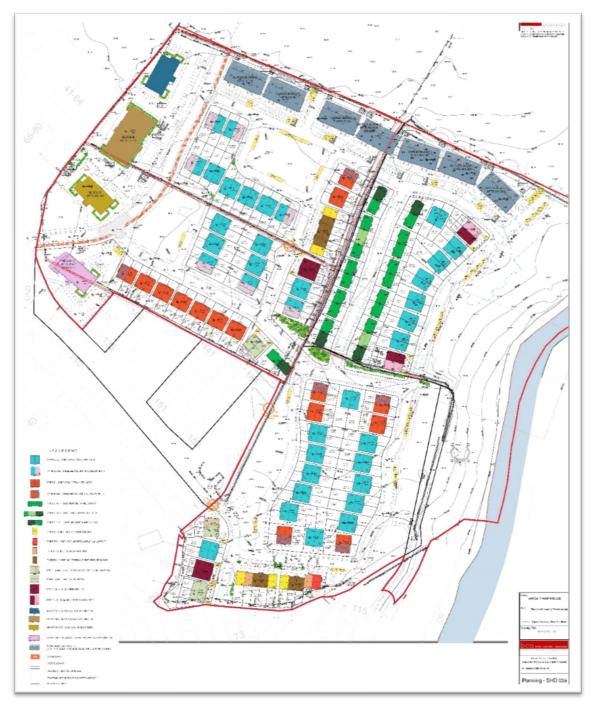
Rotated View above (Site Plan) – Initial sketch Site Plan issued for first consultation with Kildare Co.Co.
